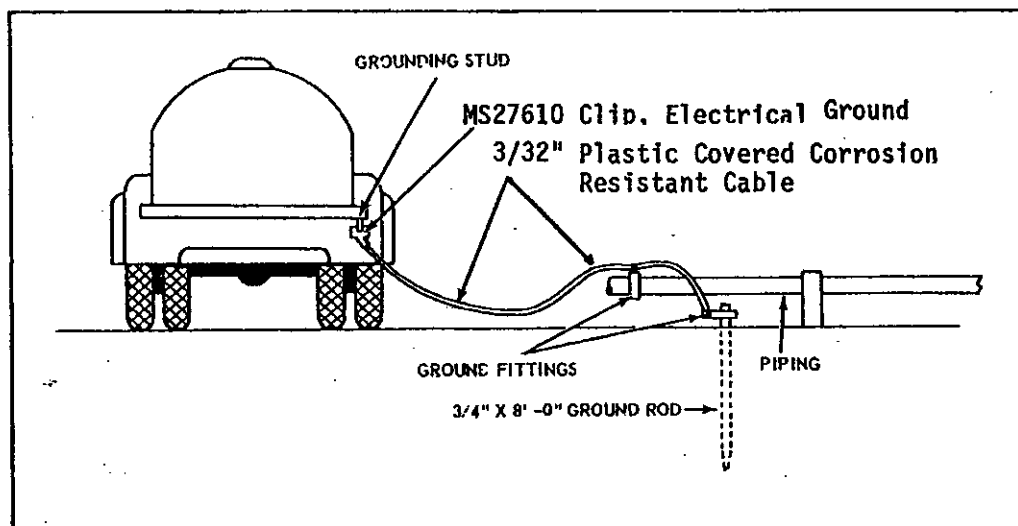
Static Ground Connections for Truck Fill Stand or Truck Unloading Facility
